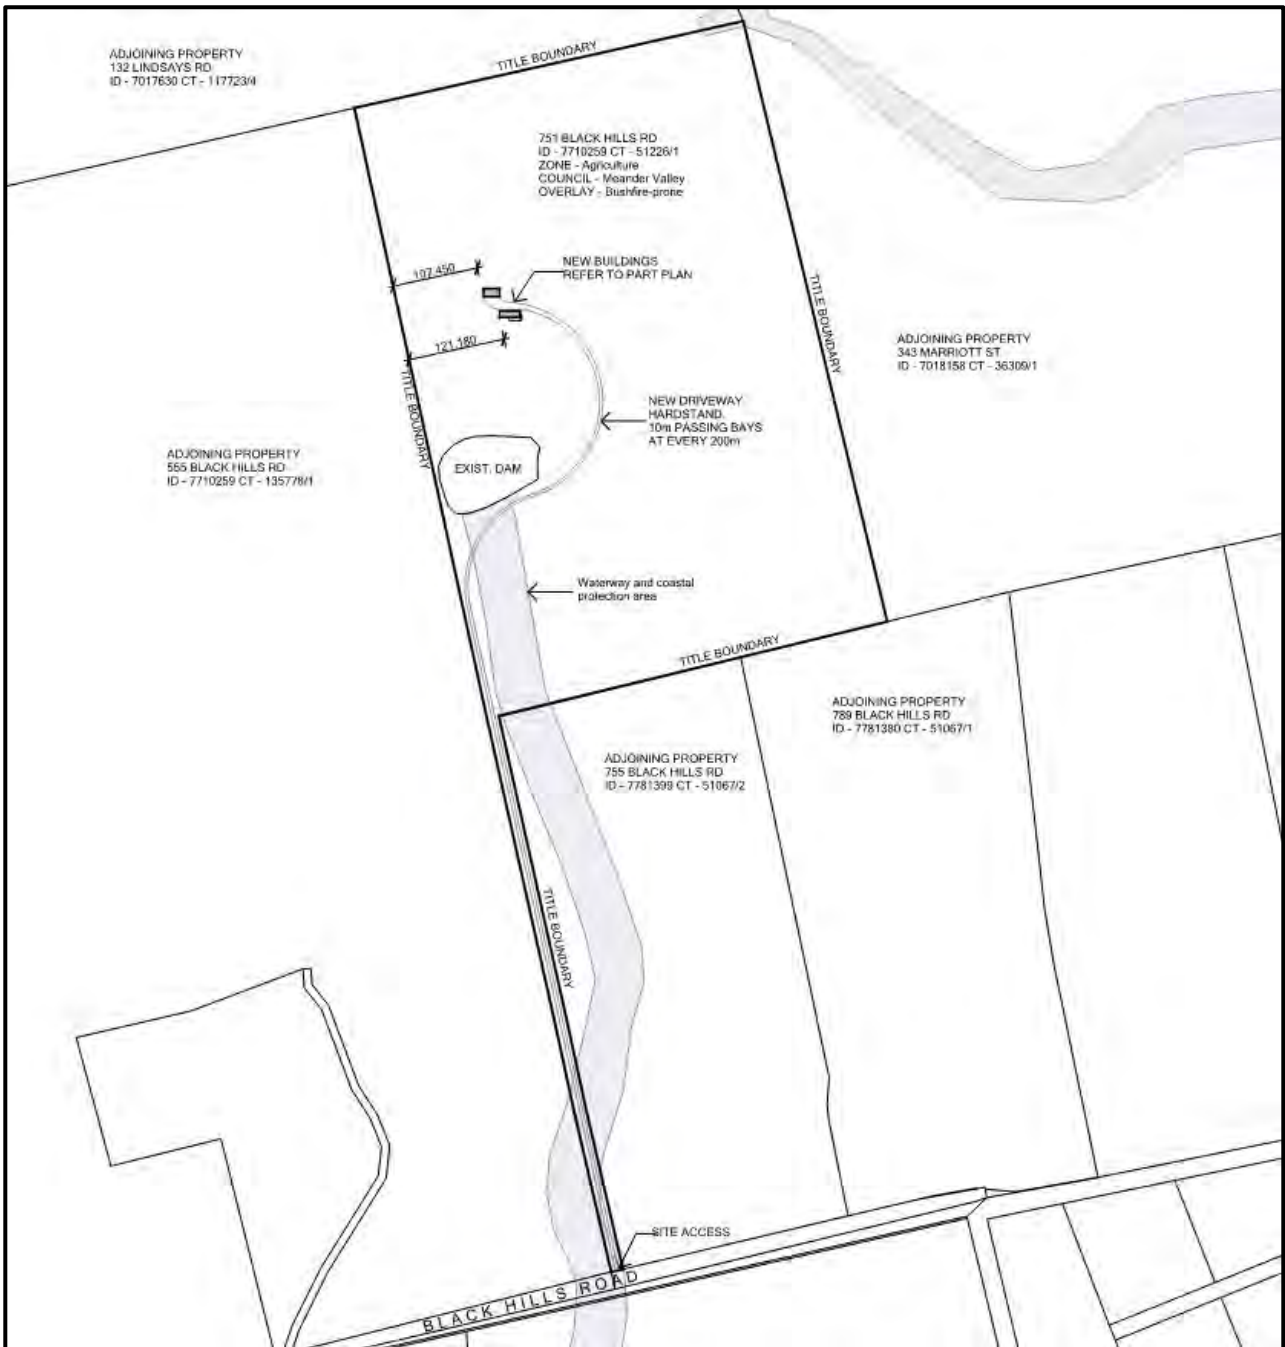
Excerpt of the submitted site plan showing the location of the proposed building and driveway within the site.
